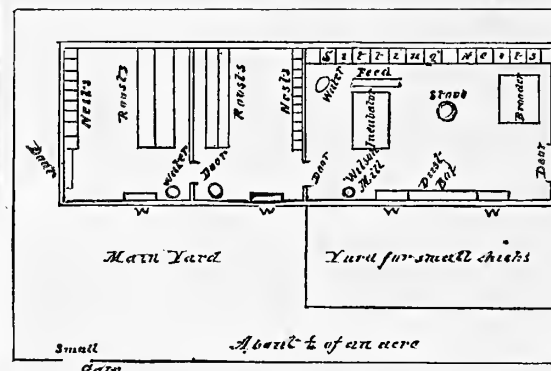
GROUND PLAN OF THE POULTRY HOUSE.
